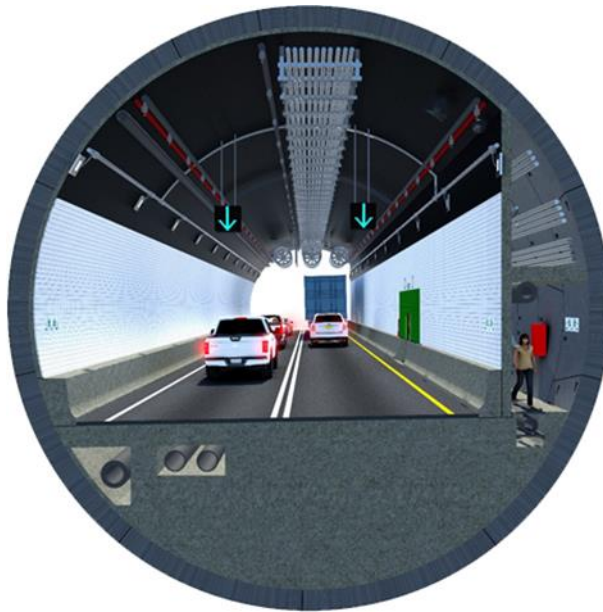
Cross section rendering of the Alaskan Way Viaduct.
